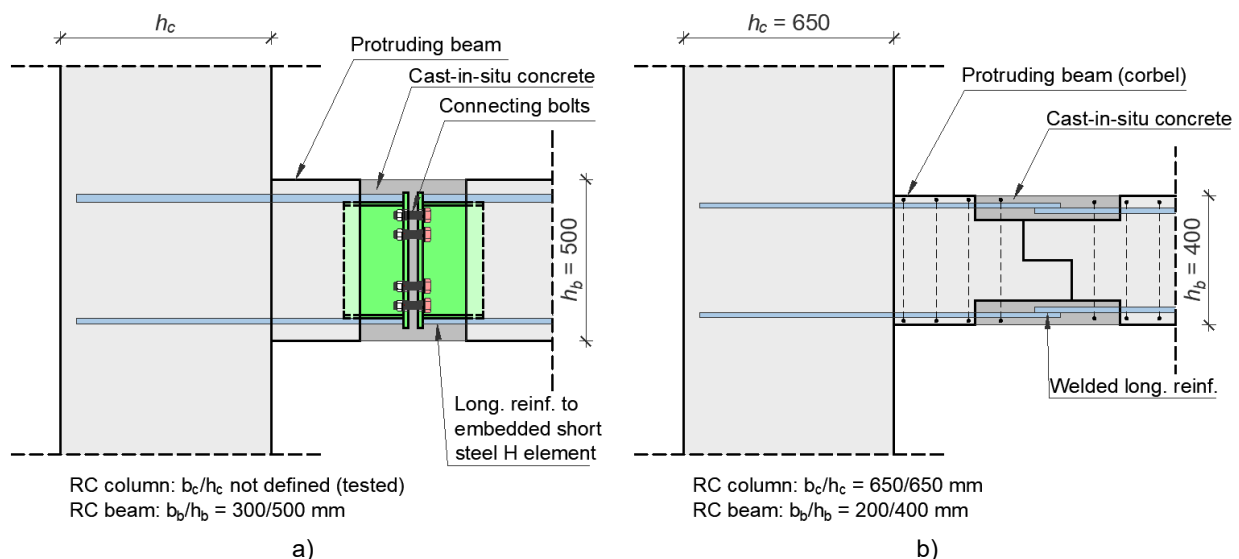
Beam-to-column joints with partial cast-in-situ concreting: (a) bolted connections with embedded steel plates (adapted from Ong et al. [44]), (b) connections with dapped-end beam and welded longitudinal reinforcement (adapted from Xiao et al. [45])
